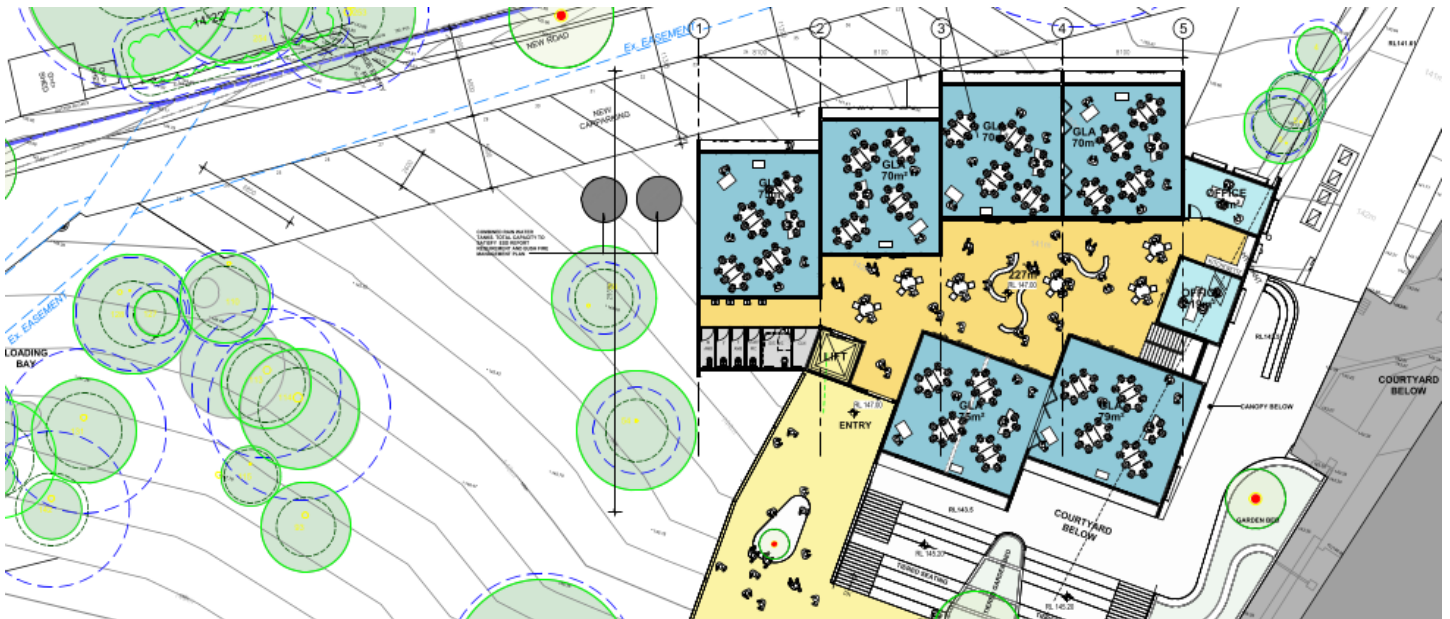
Extract of the Ground Floor Plan showing the typical floor layout and flexible classrooms
